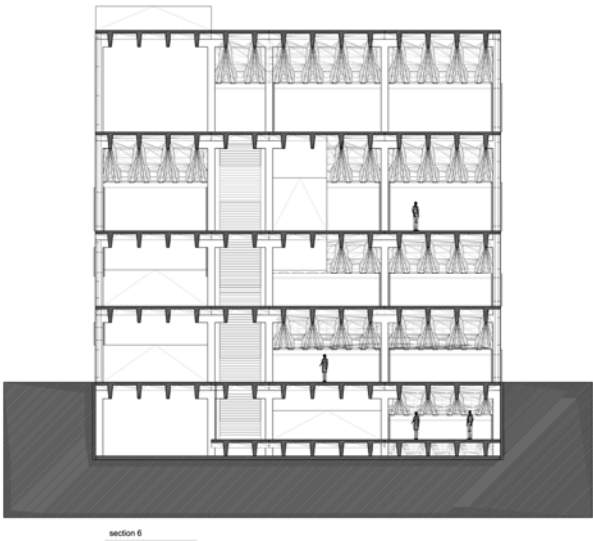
Detailed section of the slab and rib profile used in the design of the Contemporary Art Gallery.
